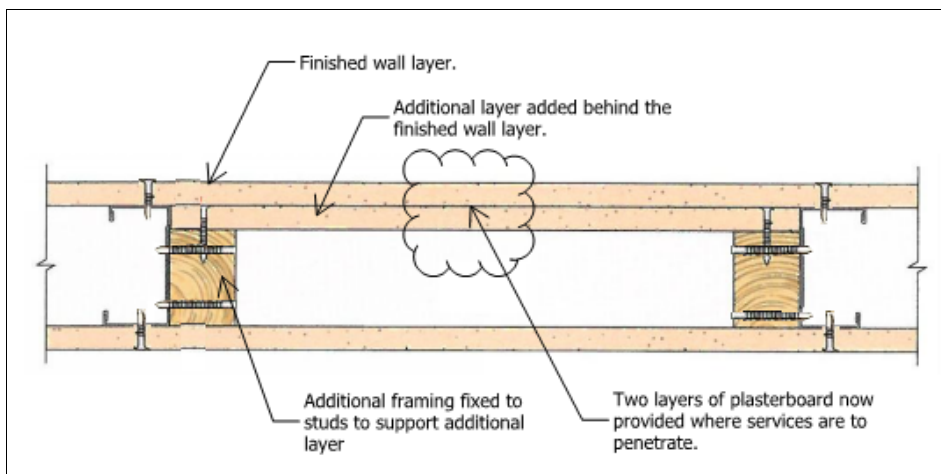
Provision of Additional Lining Thickness behind Finished Wall Layer.
